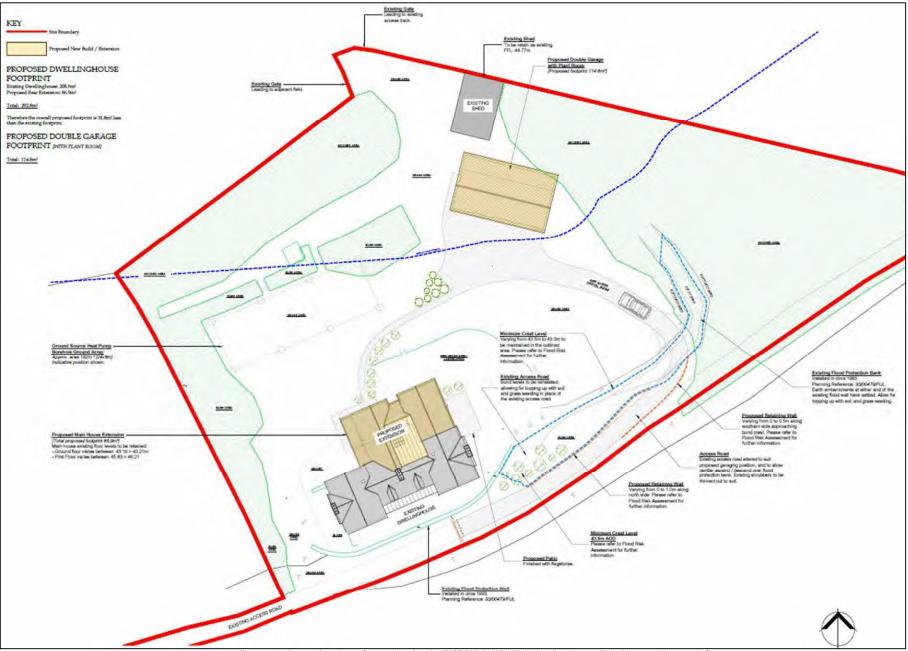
Proposed site layout (excerpt from Drawing BOM-SAB-DH-XX-SP-A-0201_P06 Proposed Site Plan - see Plans section)
